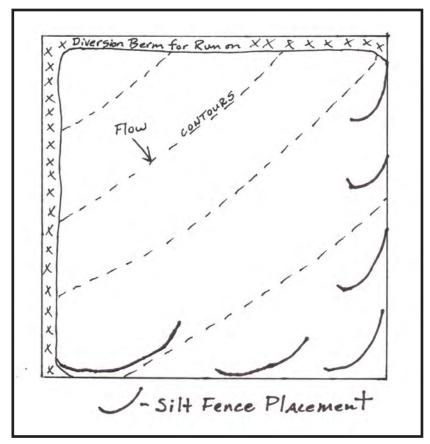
Placement of J-hook silt fence along the perimeter of a construction site to slow and pond small areas of stormwater runoff.
